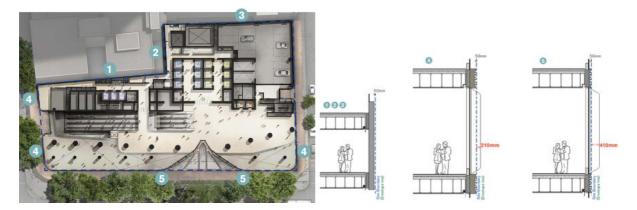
| Podium projections beyond building envelope (Source: EIS)
